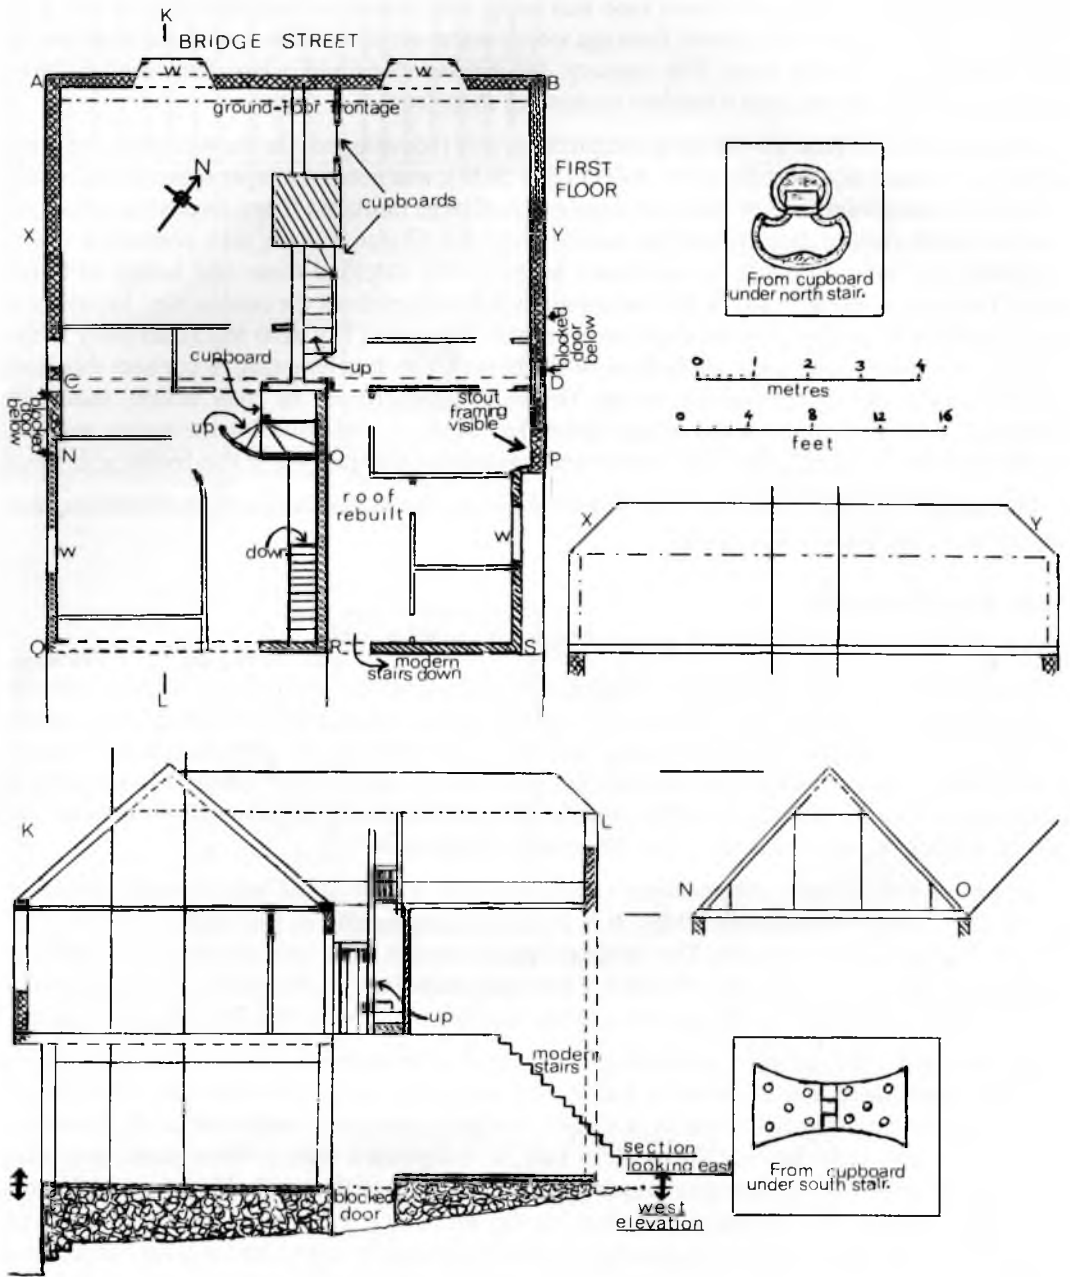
39/41 BRIDGE STREET: SURVEY MADE IN 1975.
